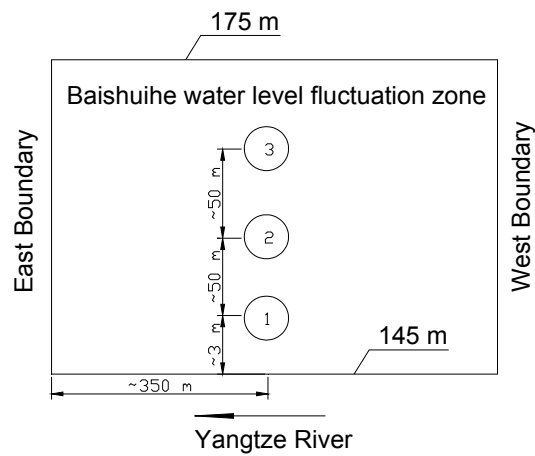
Layout of field permeability test holes at Baishuihe landslide
